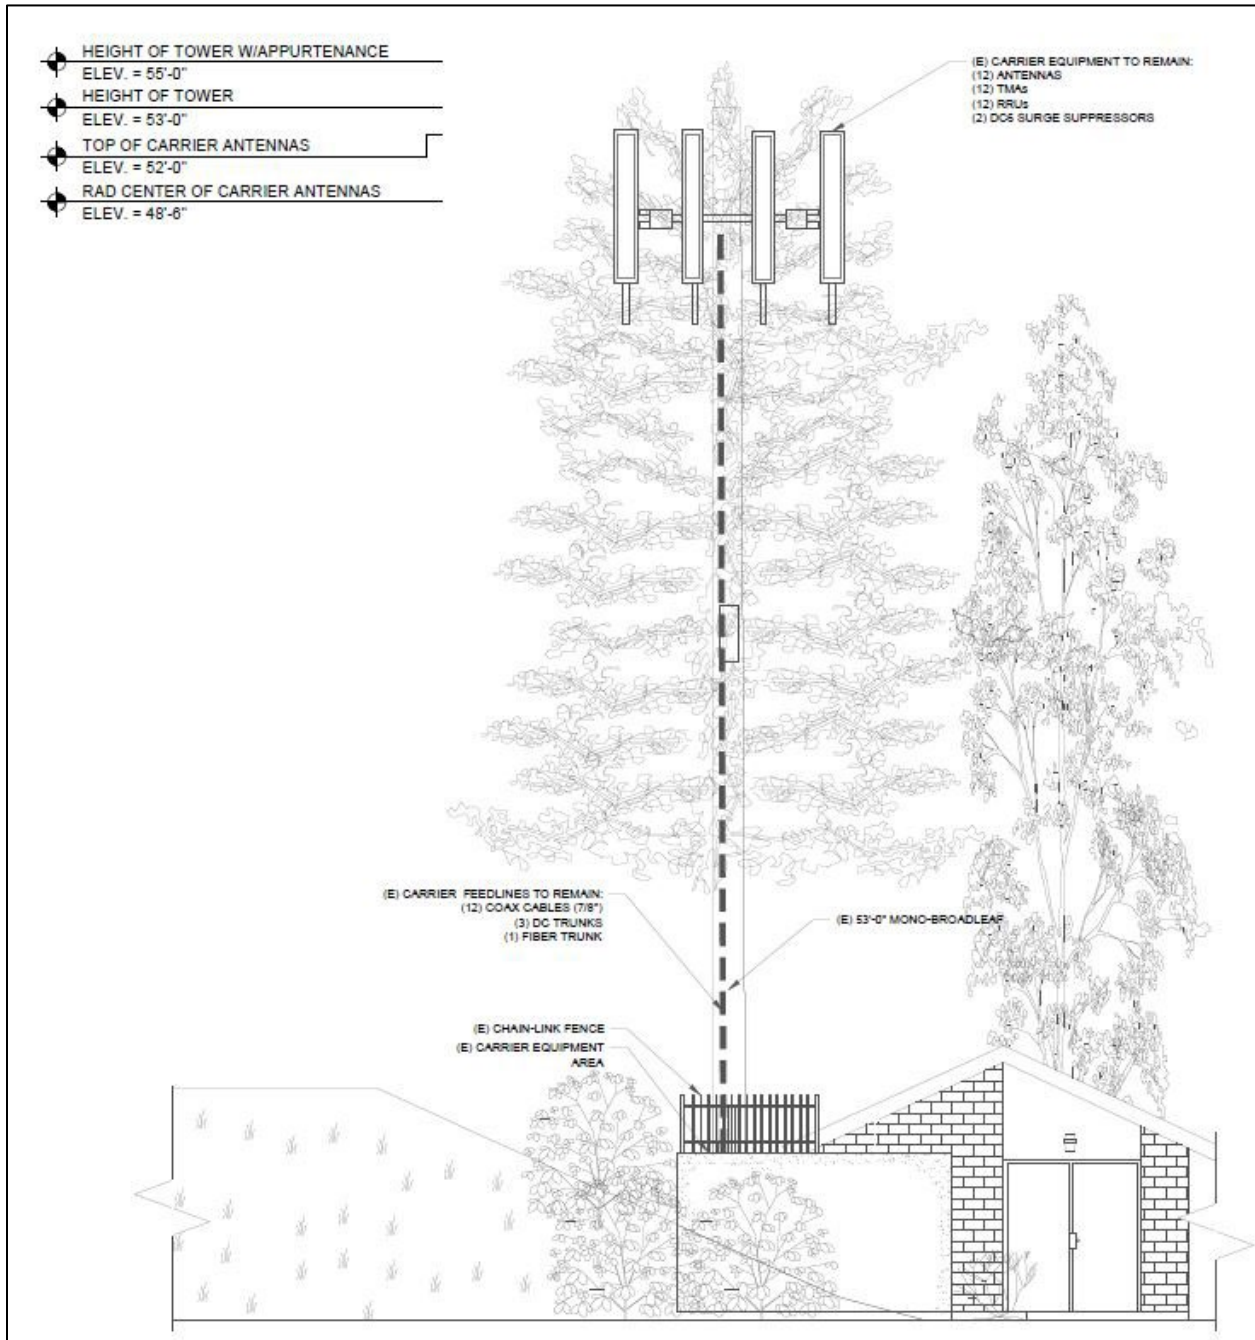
Elevation view of existing AT&T wireless facility. (Source: Plans, Page C-2.2).
